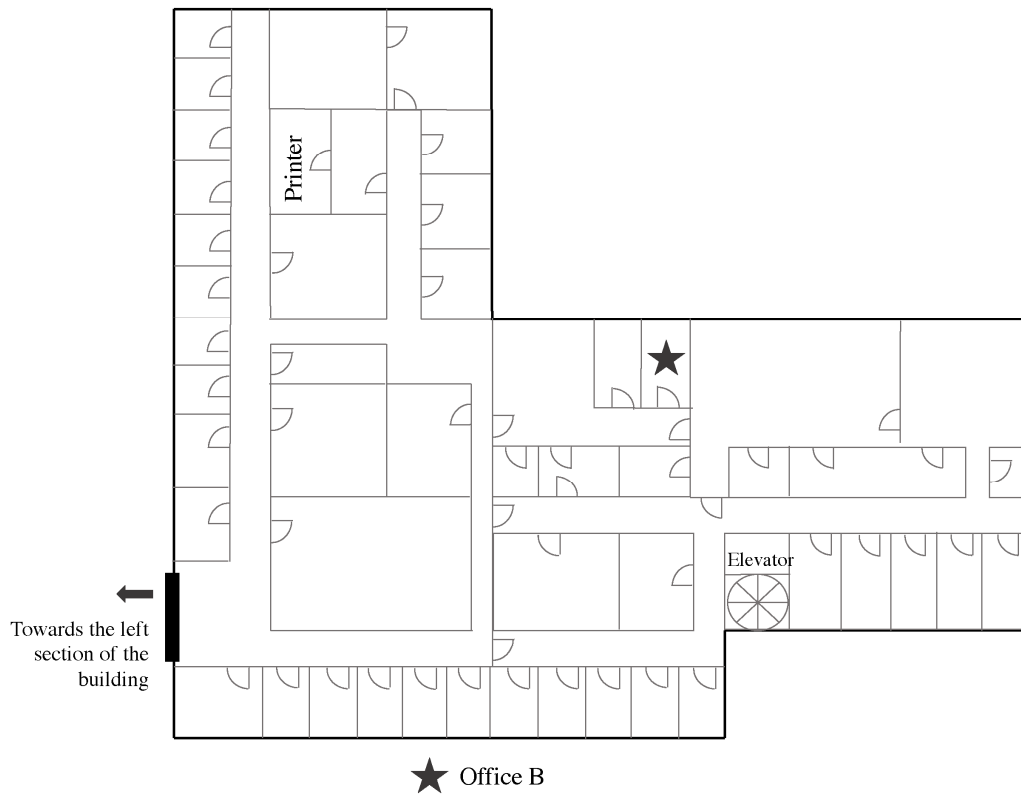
Floor plan of the right section of the building. Location of office B.
